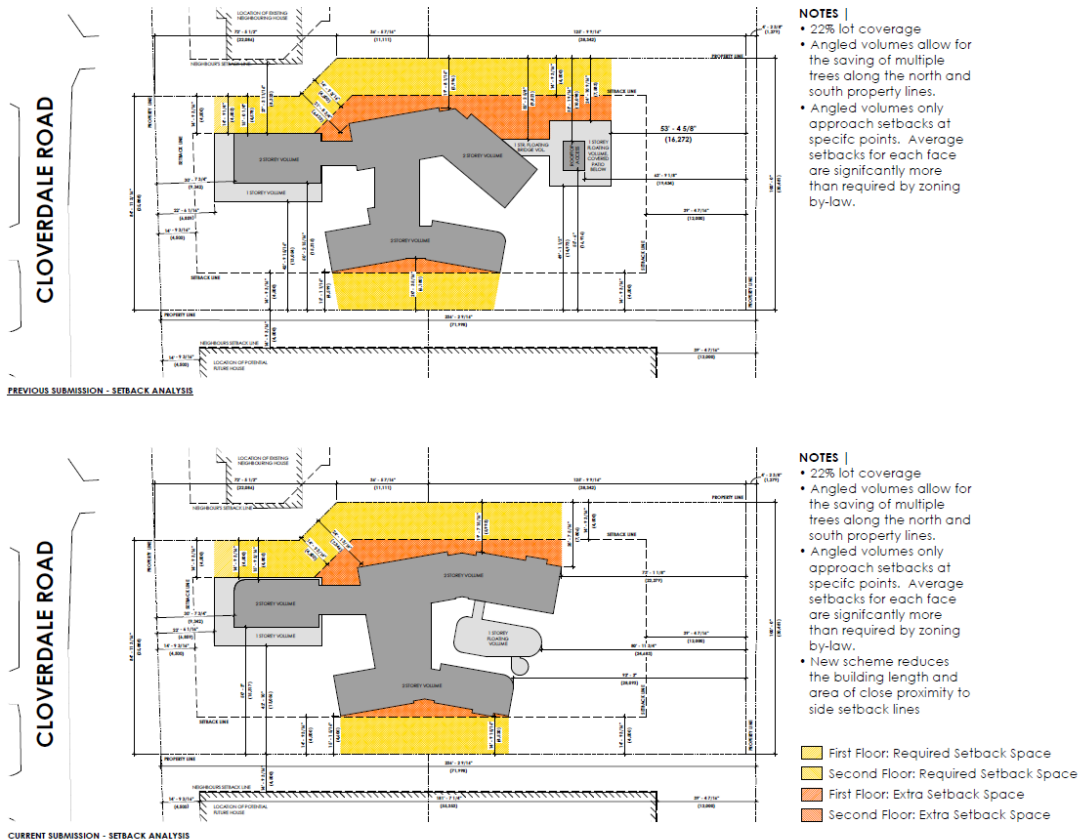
Setback Analysis of the revised plan in comparison to the earlier layout.
